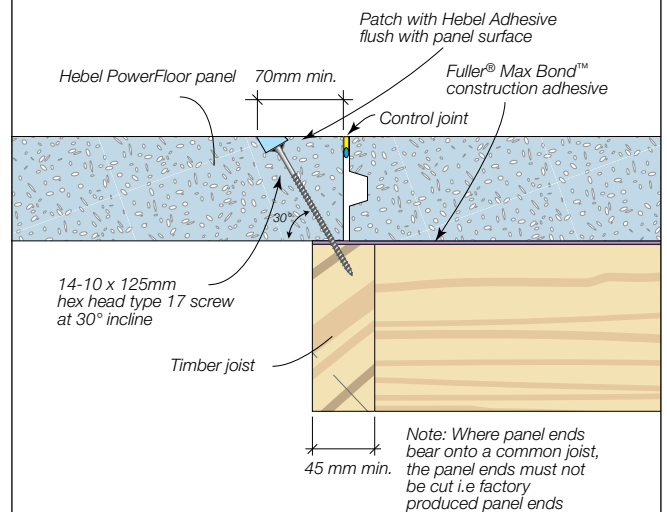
Fixing of Hebel PowerFloor Panel to Timber Joists
